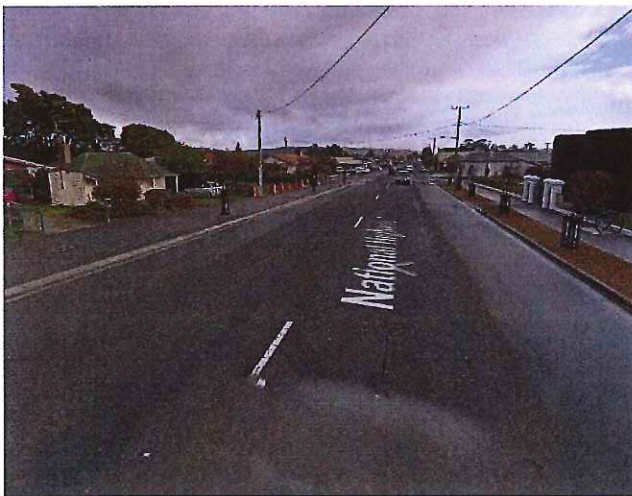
Main Road in vicinity to Scone St (looking north towards Launceston)
